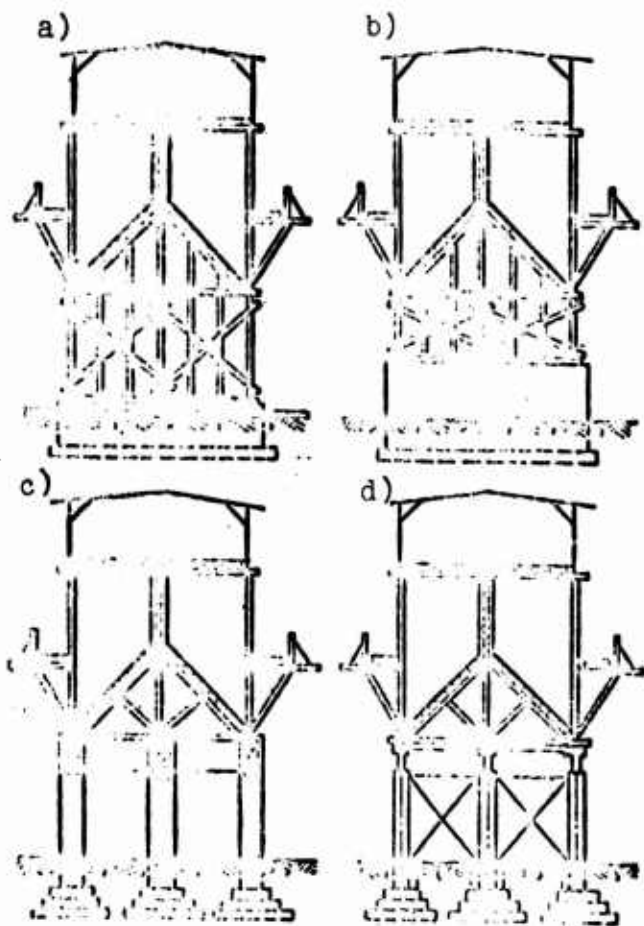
The diagrams of double-sided hoppers with lateral unloading: a) diagram of a wooden hopper; b) diagram of a hopper with wooden structures having a height of 1.0-1.5 m over the level of planning; c), d) hoppers of complex structure with the equipment of the lower part of the construction made from monolithic or precast reinforced concrete with wood in the upper part.
